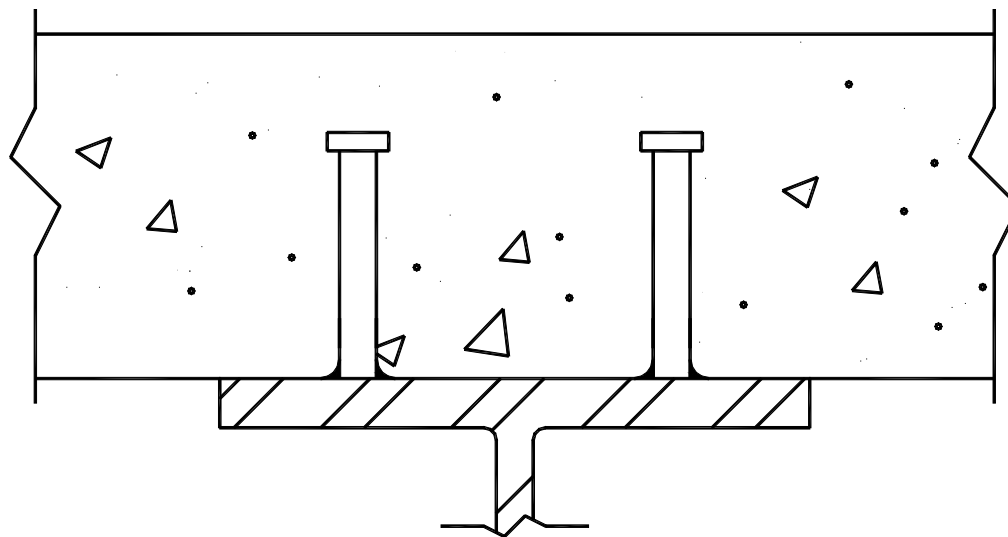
Cast-in-place welded stud (CIPST)
